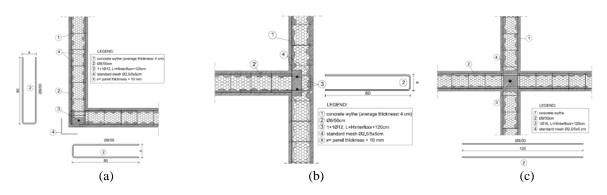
"Special panels" used to obtain the connections between (a) two, (b) three and (c) four orthogonal walls.
